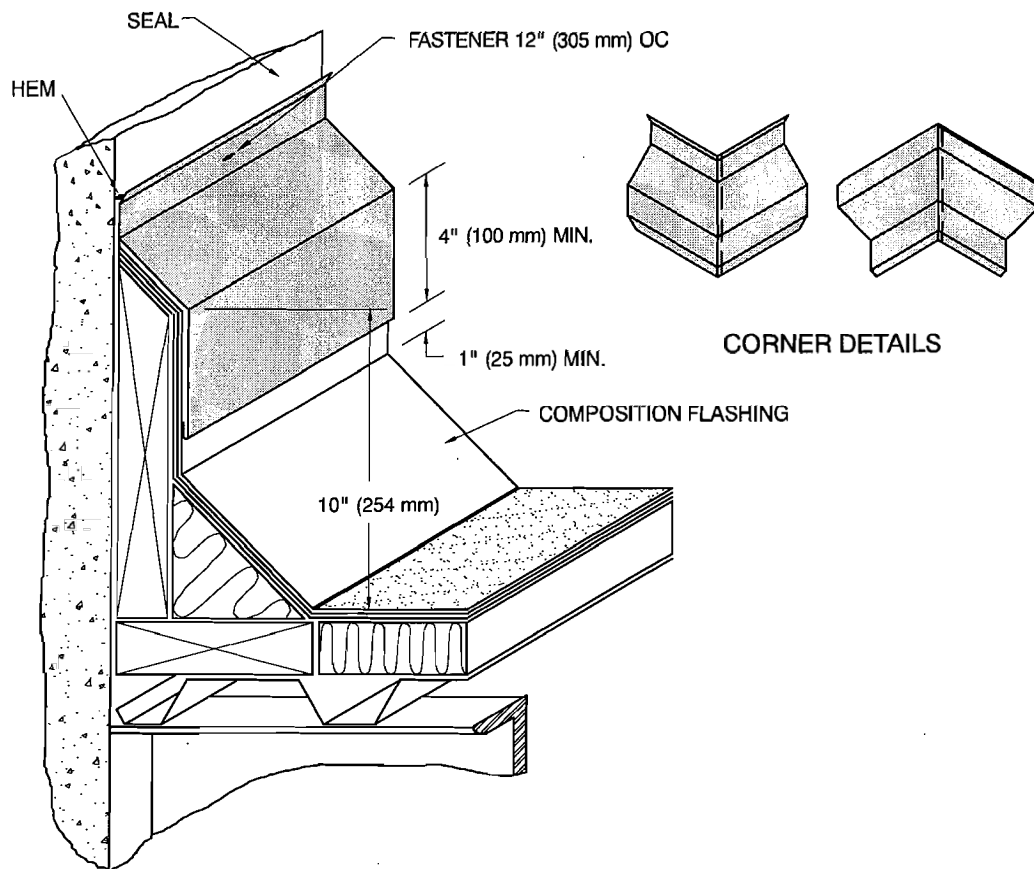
COUNTER FLASHING SYSTEMS — INSTALLATION
